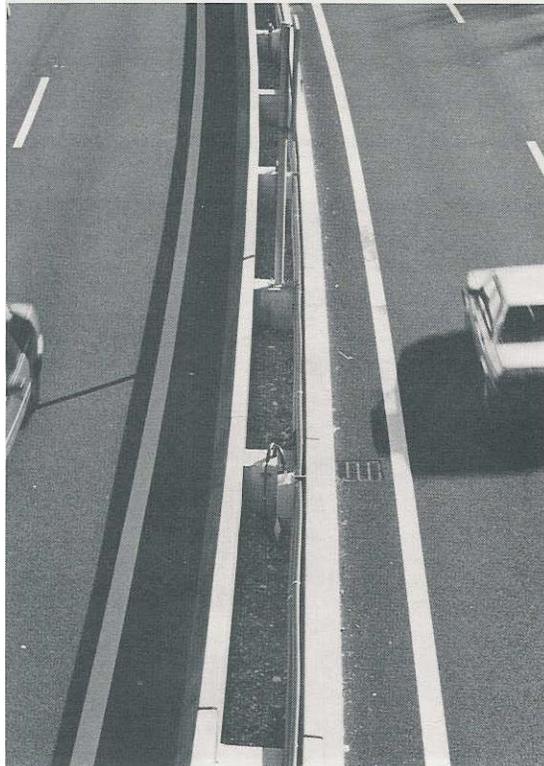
Looking down at piping for automated sprinkler system in concrete barrier.
